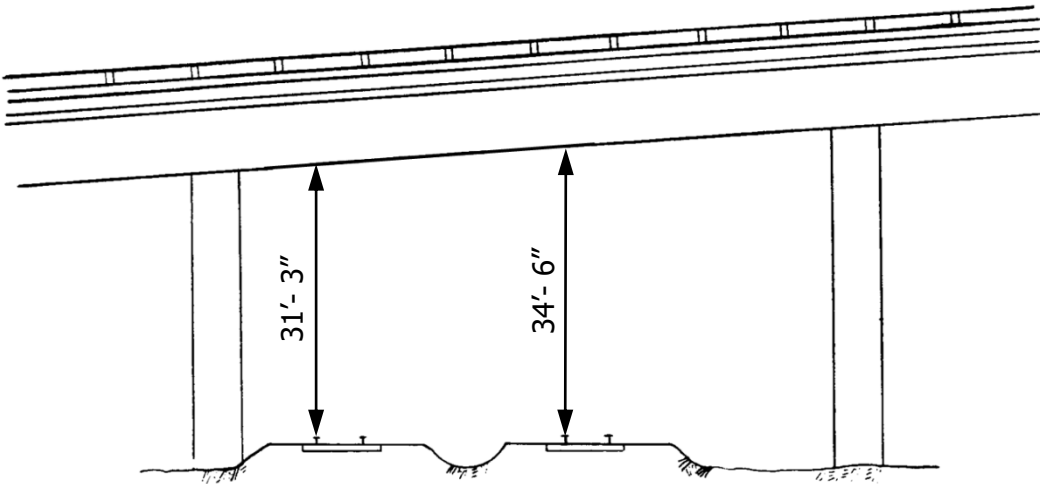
Bridge elevation view with an electrified passenger rail track and a non-electrified passenger rail track below the bridge.
